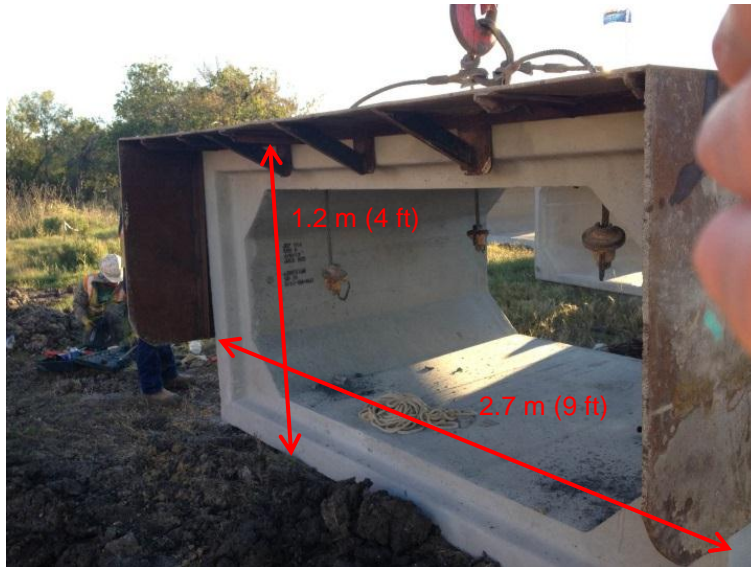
Schematic Box Cross Section of Navarro County Project
